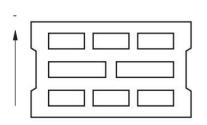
Lightweight concrete masonry units — Geometry 1,0/x
